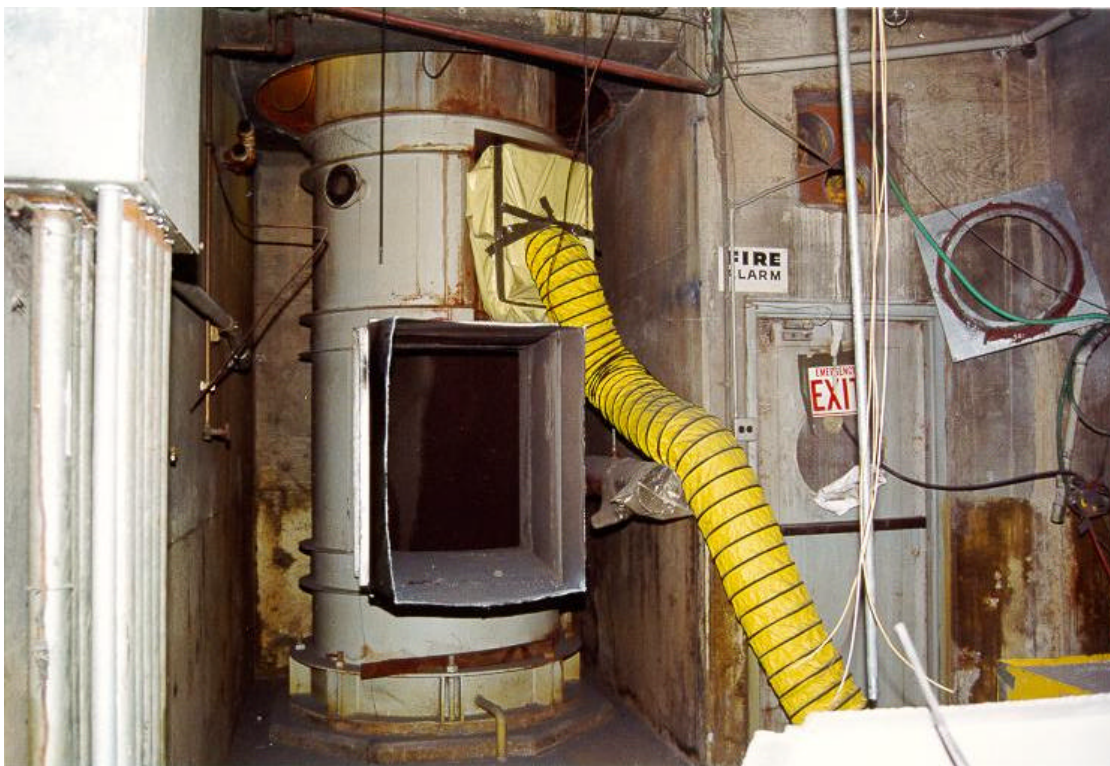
Basement Section of the Facility Exhaust Stack. [ETEC-10/2/96-394904]
